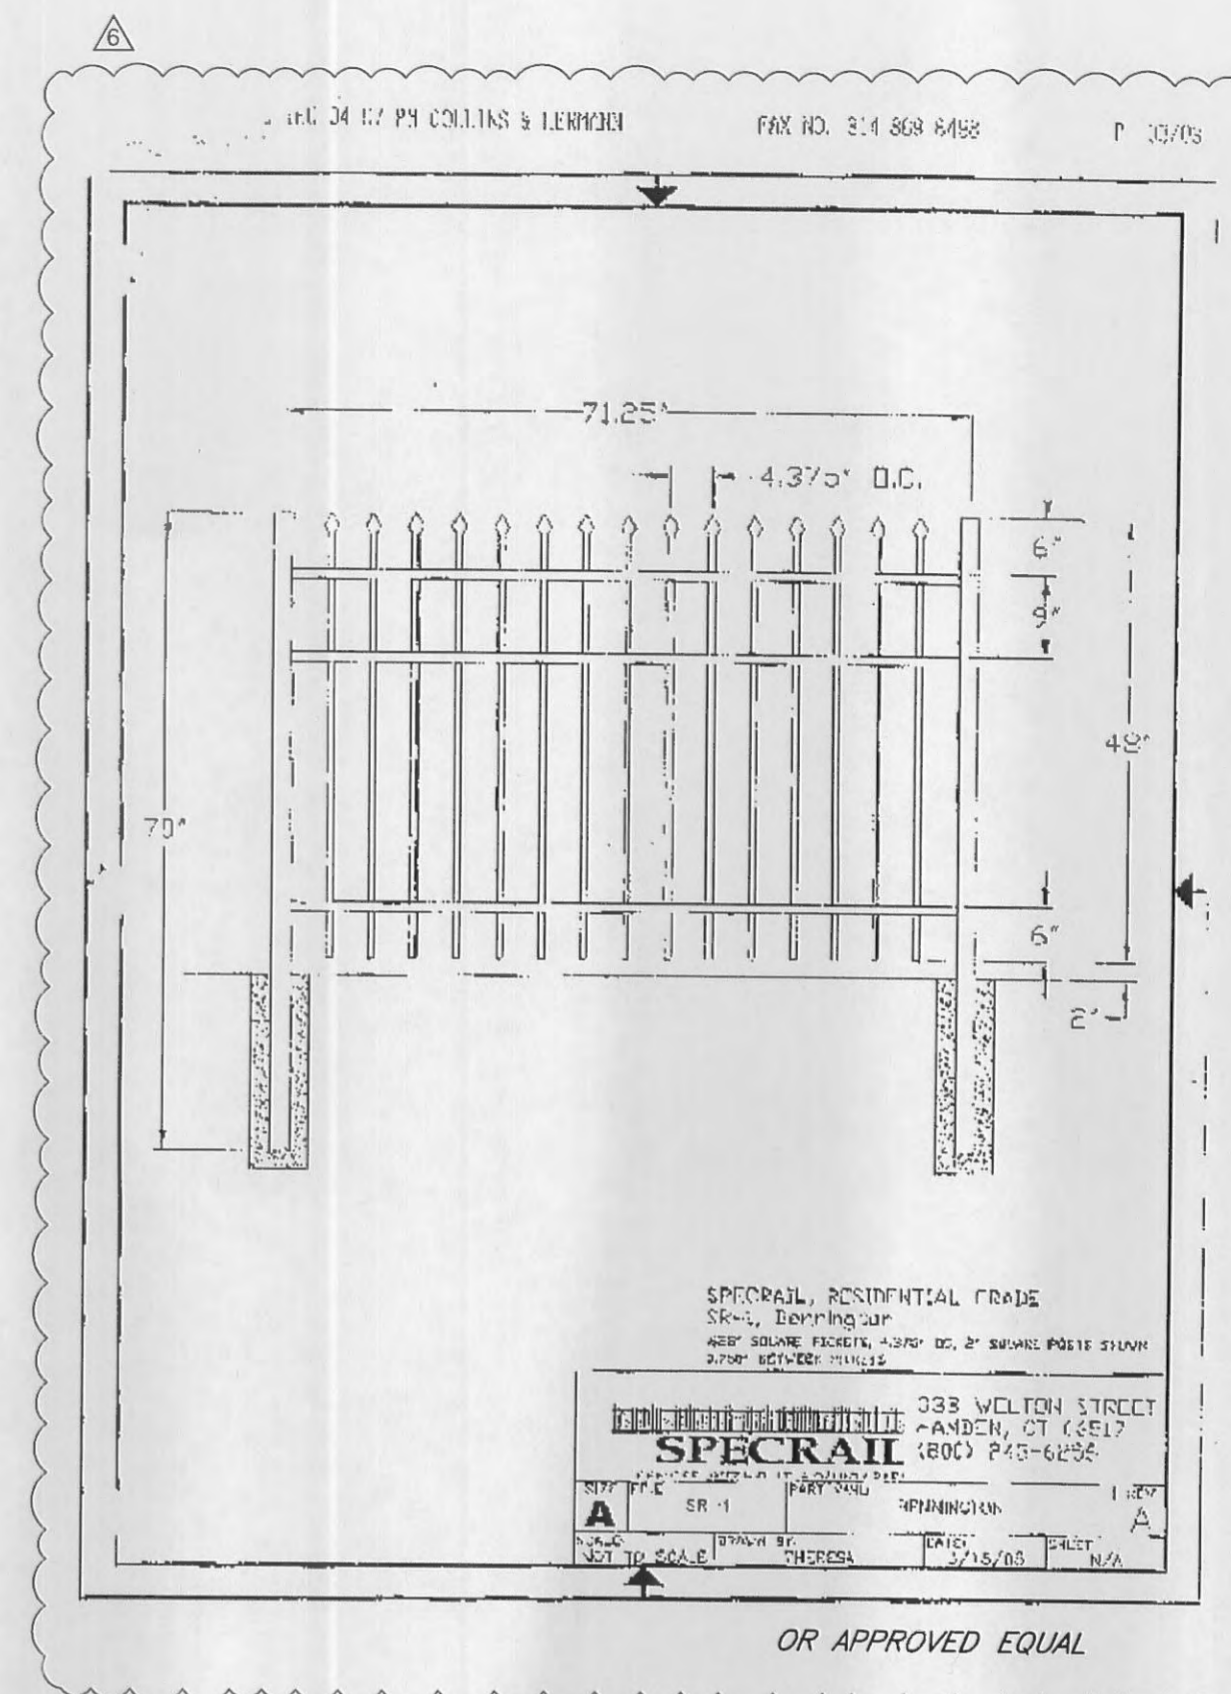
# DETAILS FOR COMPONENT BAR PRODUCTS BUILDING EXPANSION
